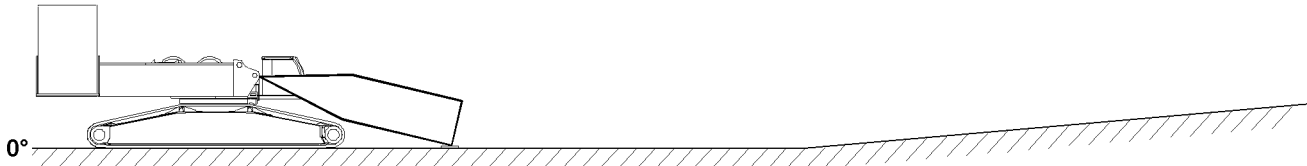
Disassemble and remove the boom - intermediate sections to the boom - pivot section
